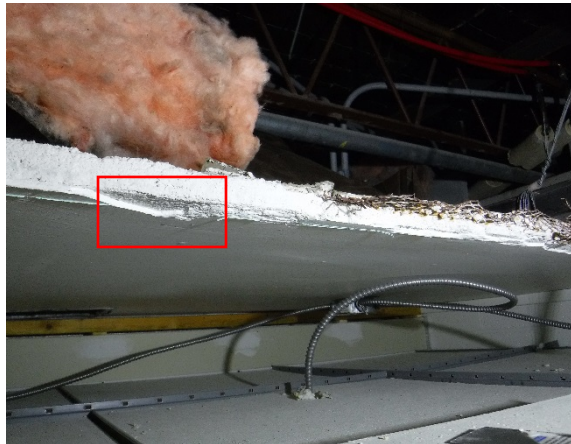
Photo of sample AS-20, Staff Washroom, Ceiling – Texture Coating, 2% Chrysotile Asbestos.
